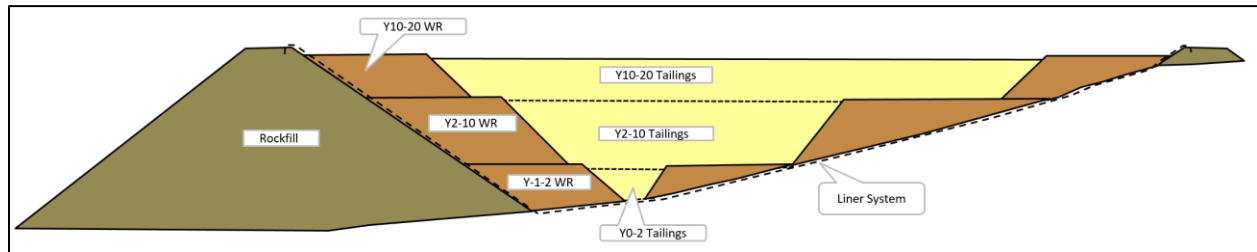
Conceptual Pyritic TSF Layout – Final Cross Section
